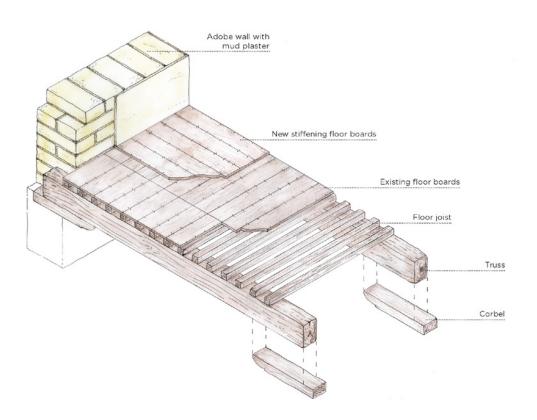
Orthogonal placement of new wooden boards for the strengthening of existing original timber floors. Source: Alessandra Sprega for the J. Paul Getty Trust.
